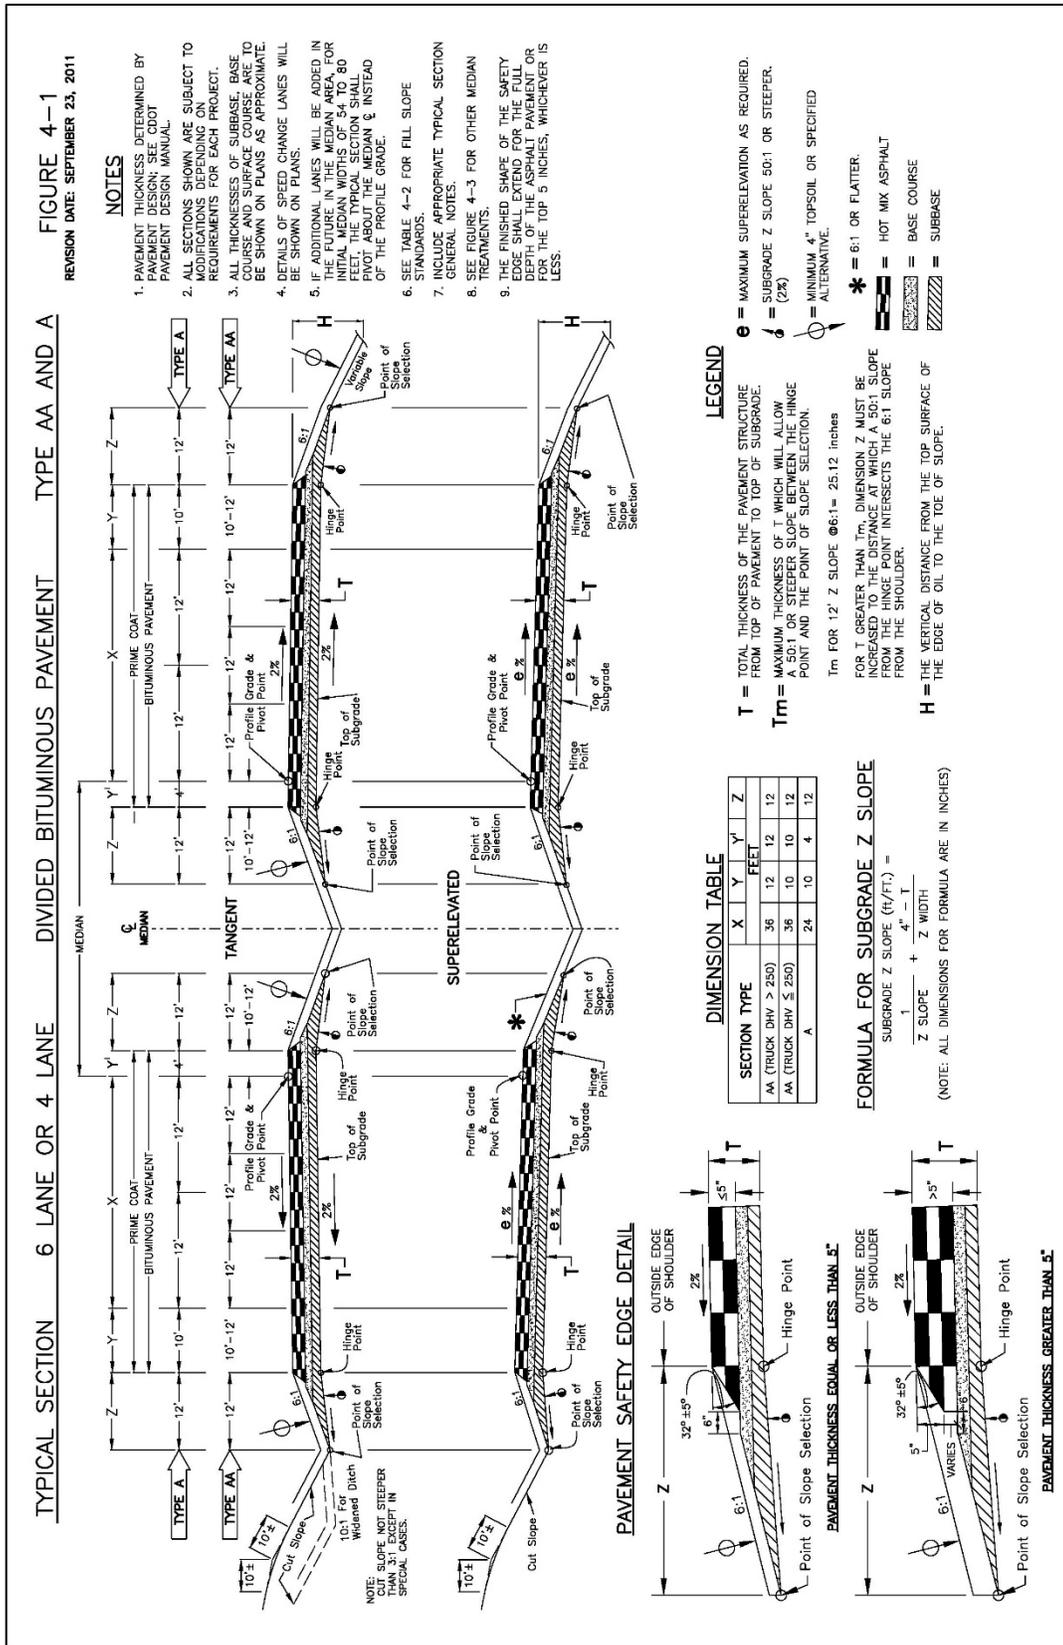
Typical Sections for Divided Bituminous Pavement
